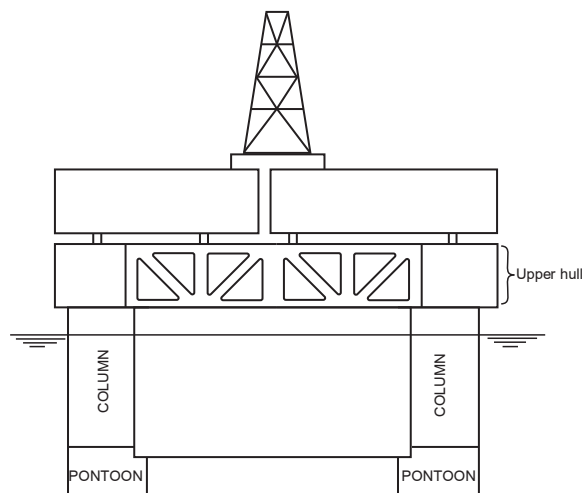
Profile and transverse view of a ring type column-stabilized or TLP unit with truss upper hull
